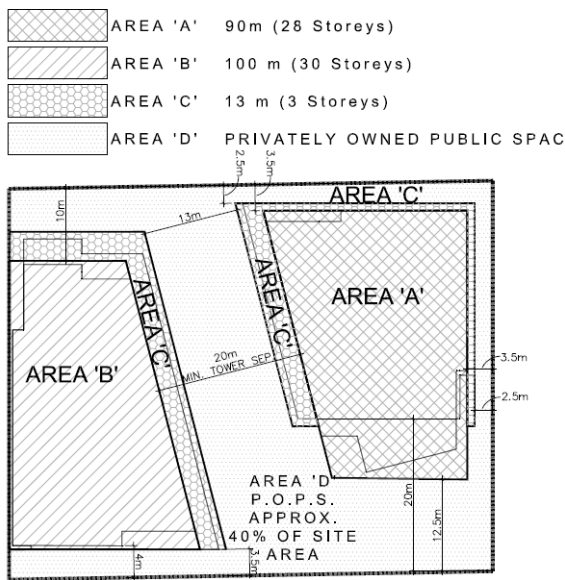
The plan illustrates the podium area, the towers setbacks and heights and separation from the lot lines. Source: Hobin Architecture 2020.
